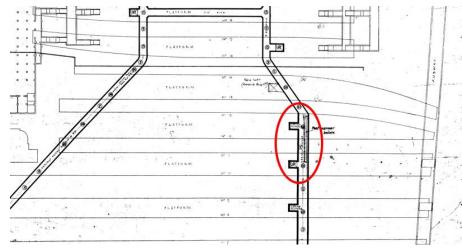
1929 plan of the Baggage Tunnels, showing the location of the Footwarmer Plant. Source: Sydney Trains VPR.
